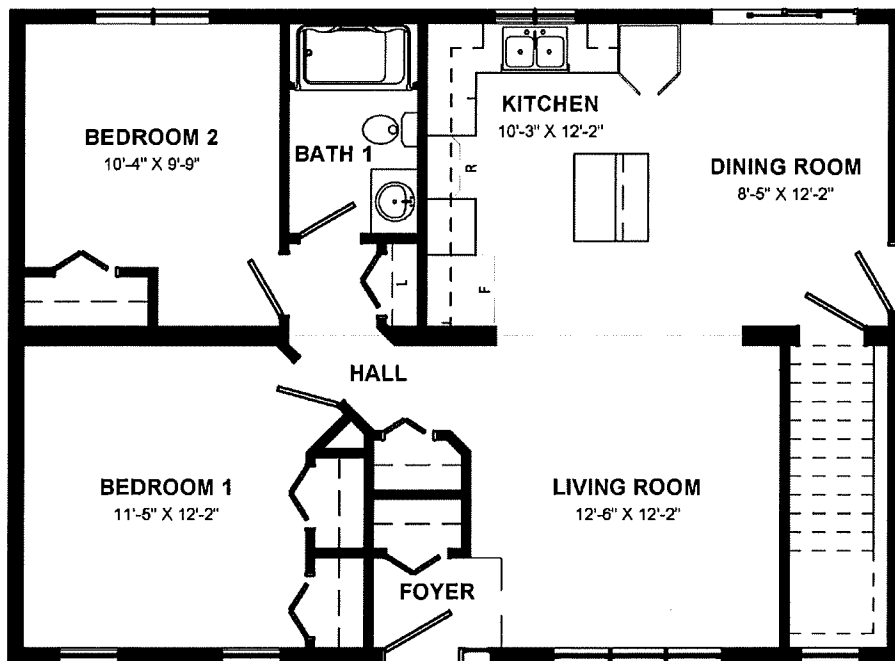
A typical floor plan of a multi-section home. Multi-section homes consist of two or more components, each with three walls attached to a roof and floor section, then are joined at the site. © Kent Homes (2019).
